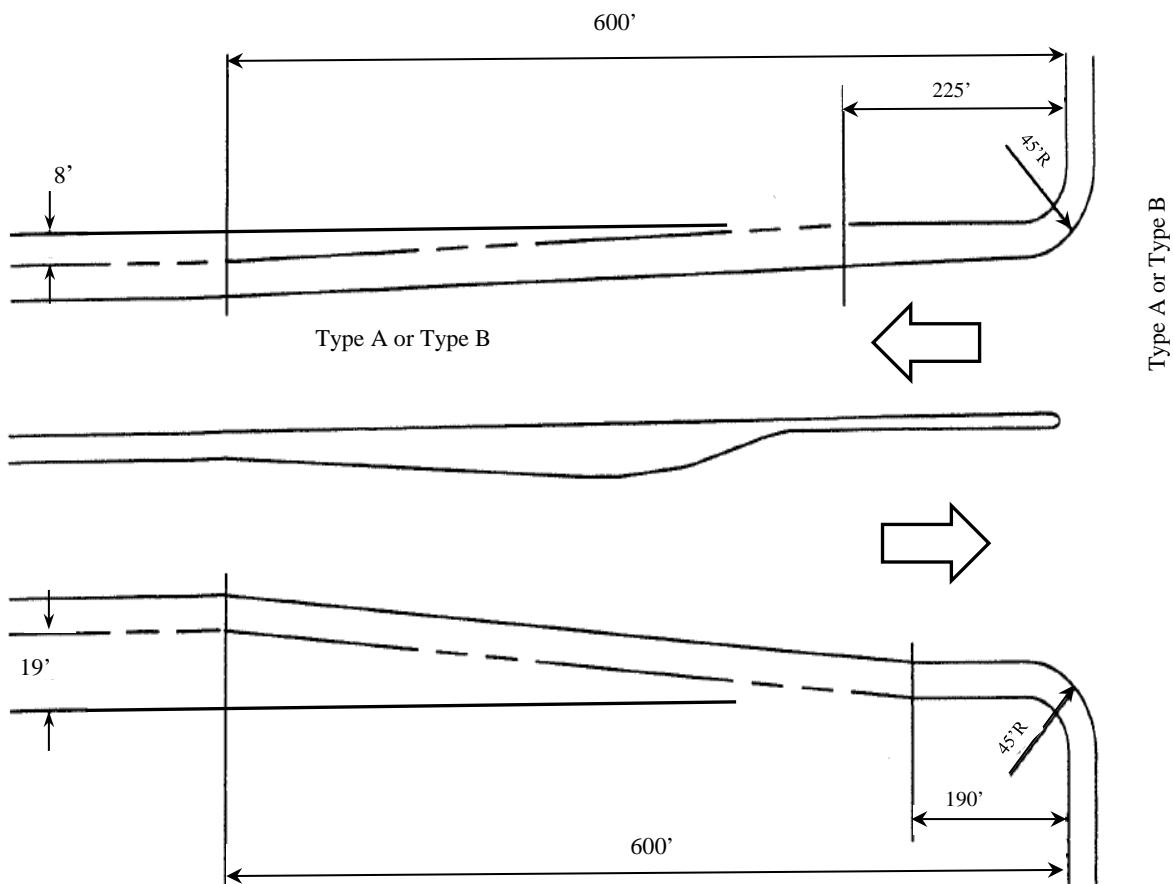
Type A/B Thoroughfare Intersection Detail
